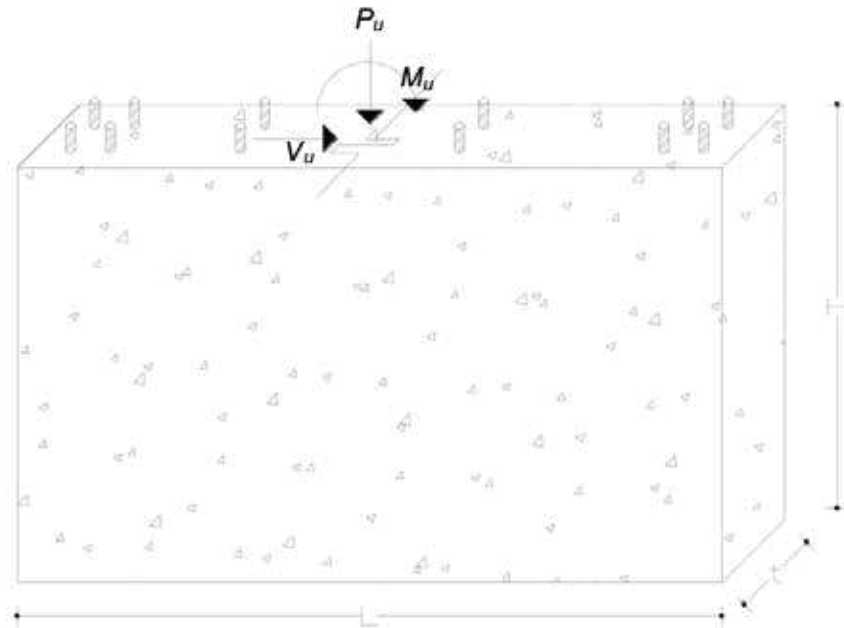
Mechanical elements acting in a reinforced concrete wall. Source: Own elaboration
